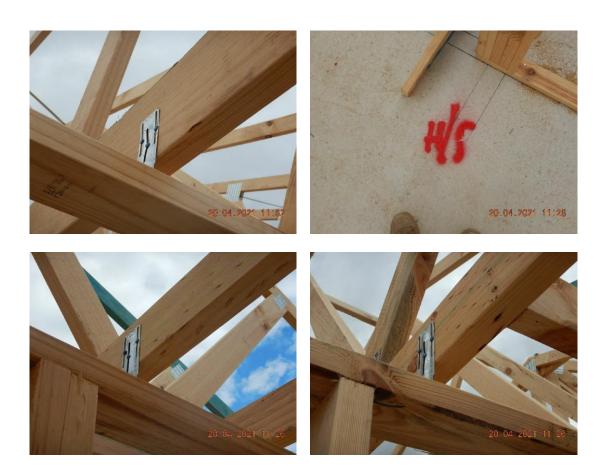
FIXING OF TRUSSES TO FREESTANDING NON-LOADBEARING WALL THAT IS NOT A BRACING WALL
